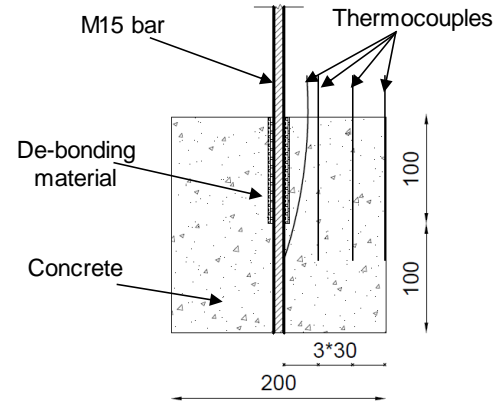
Schematic drawing of the bond strength specimens (all dimensions are in mm)
